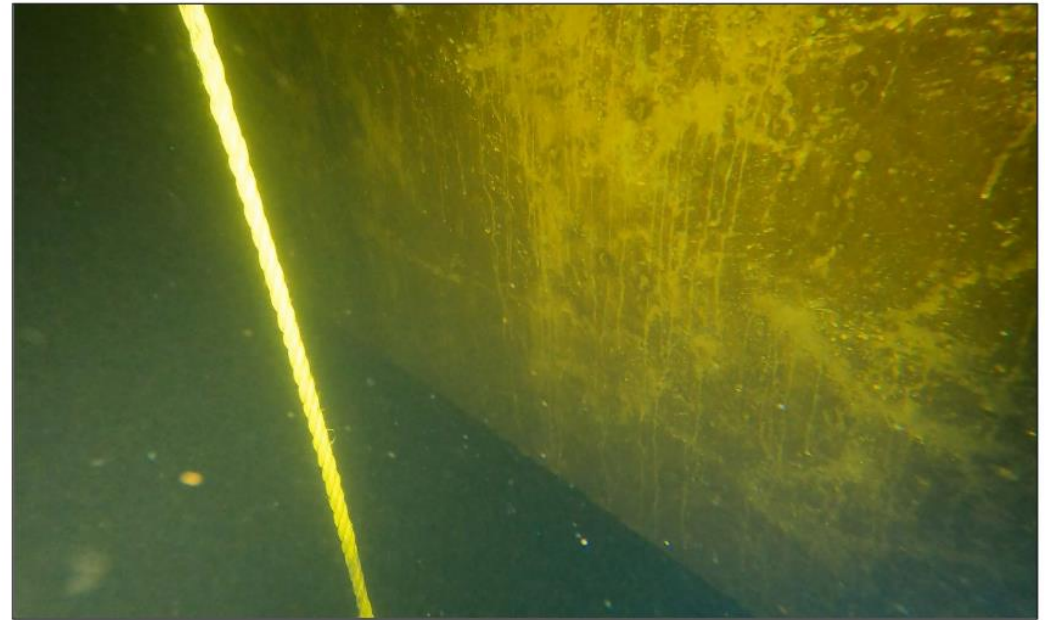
View of typical rust nodules on the steel pile casings of Pier 2.
